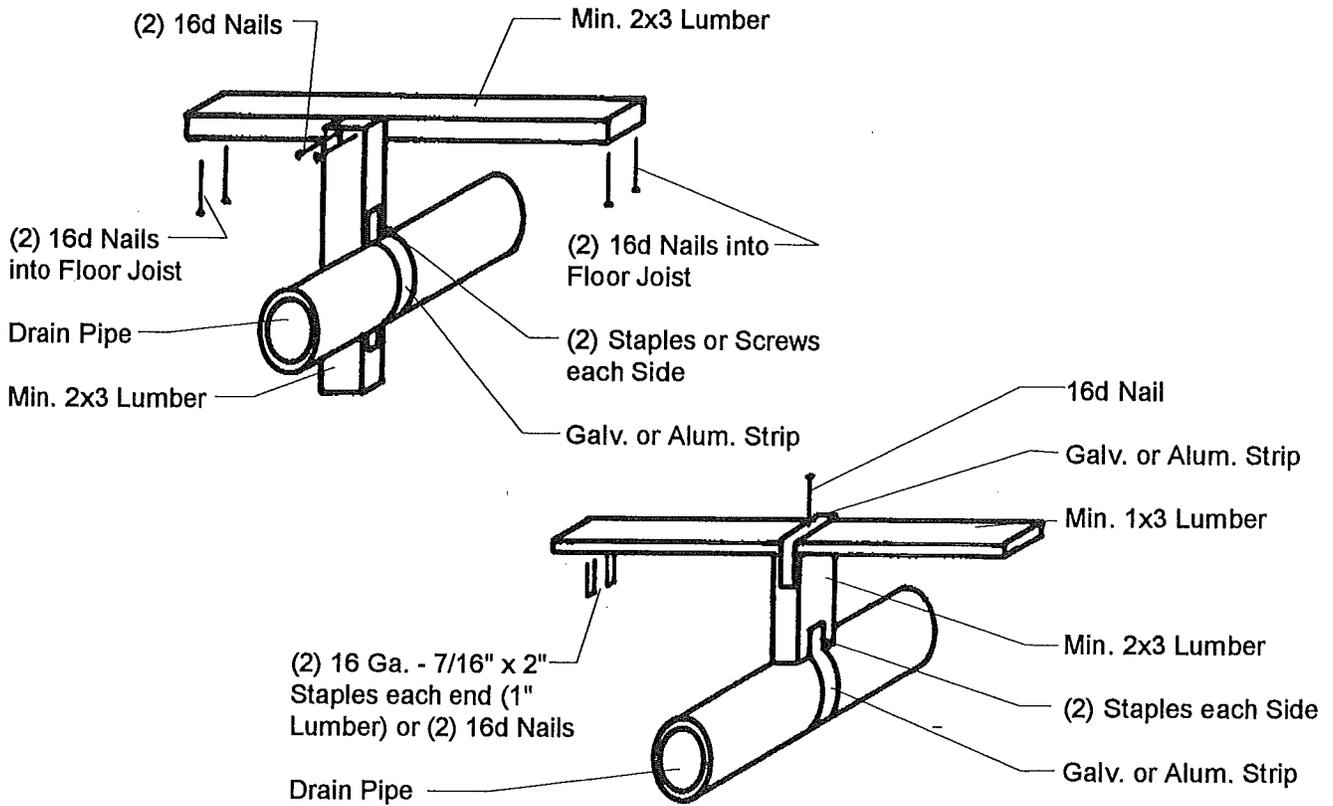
Drainpipe Crossovers, Slopes and Connections
